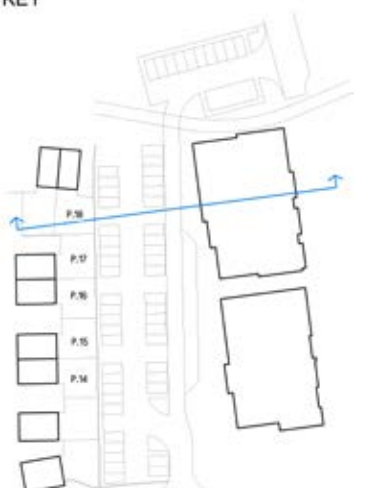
Local Centre & Plot 18 Third Floor Privacy Section post Design Workshop/Update
